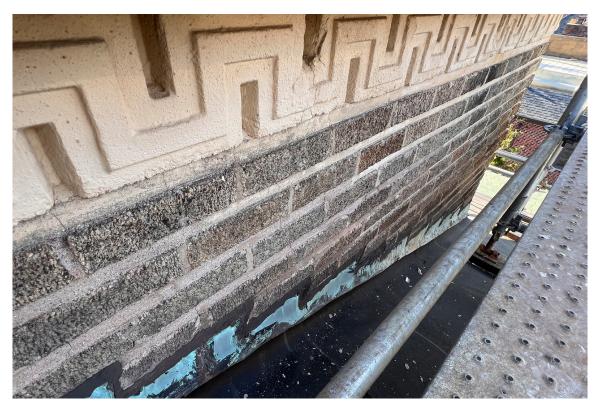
Photograph of stepped copper flashing at base of chimney.
